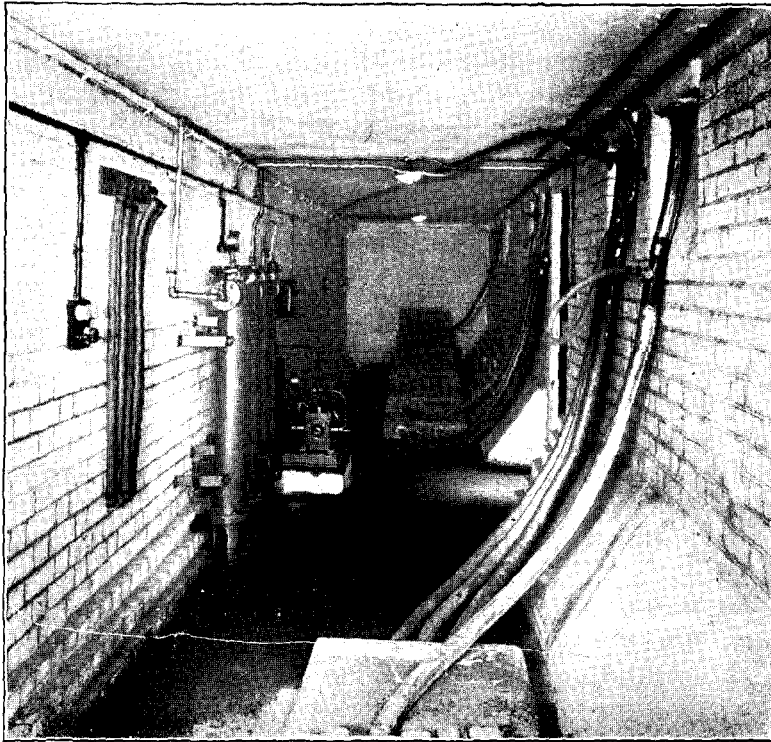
CABLE SUBWAY SHOWING CABLES AND DESICCATING APPARATUS.
